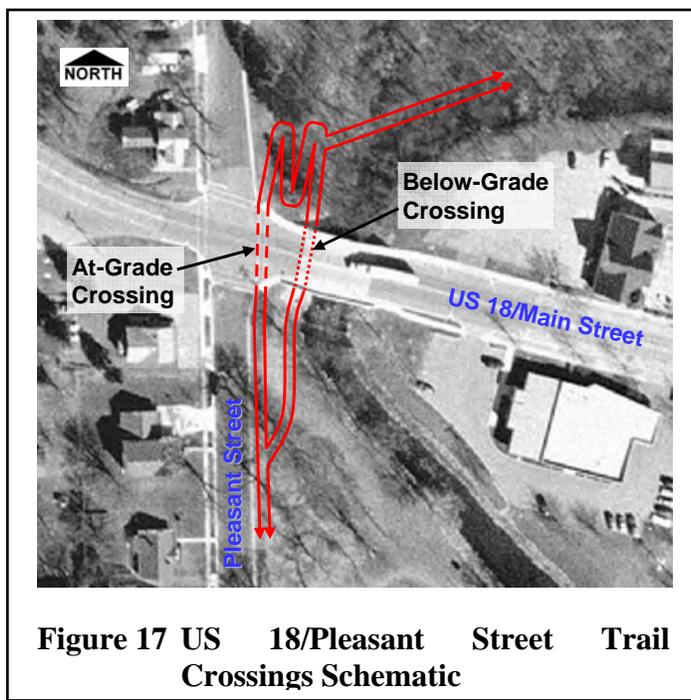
US 18/Pleasant Street Trail Crossings Schematic
